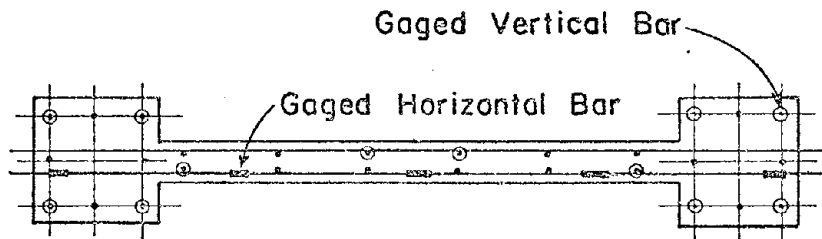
Elevation of Test Specimen Illustrating Strain Gage Layout
